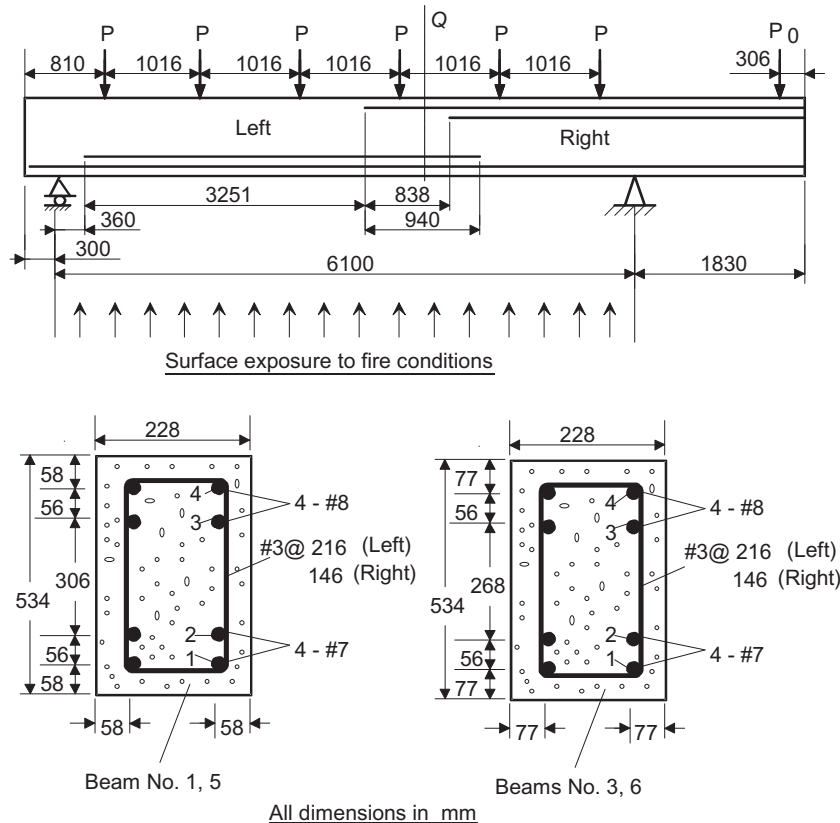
Details of tested reinforced concrete beams in fires (adapted from [65]).
